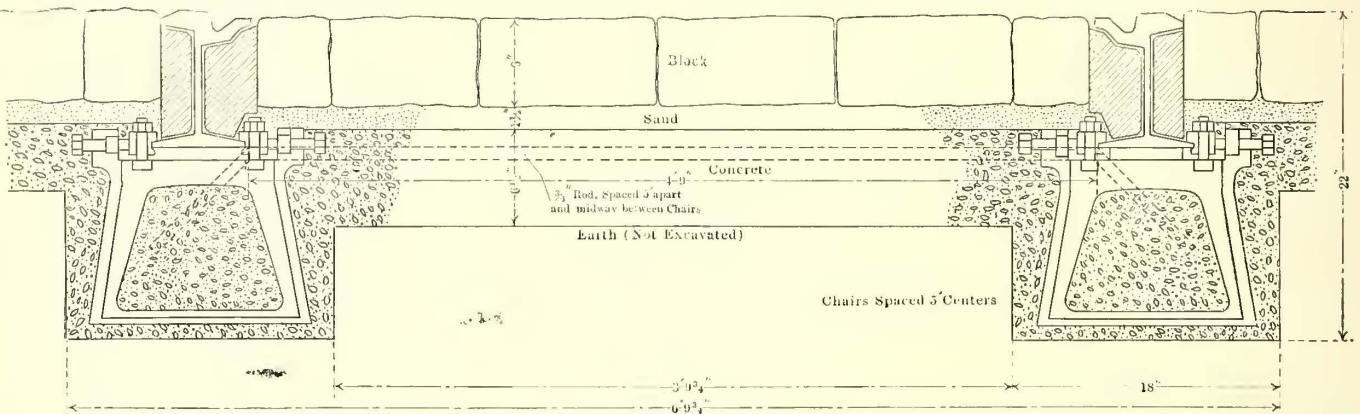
Philadelphia Rapid Transit Company—Concrete Beam and Chair Construction
